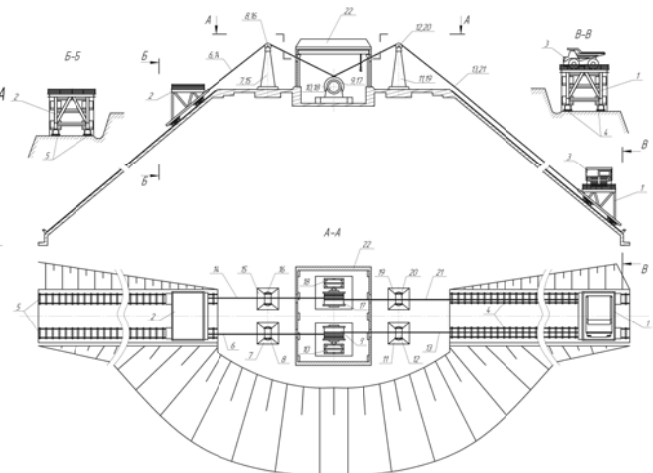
General view of a hoisting plant with an opposite-sided arrangement of two parallel tracks in a vertical plane
